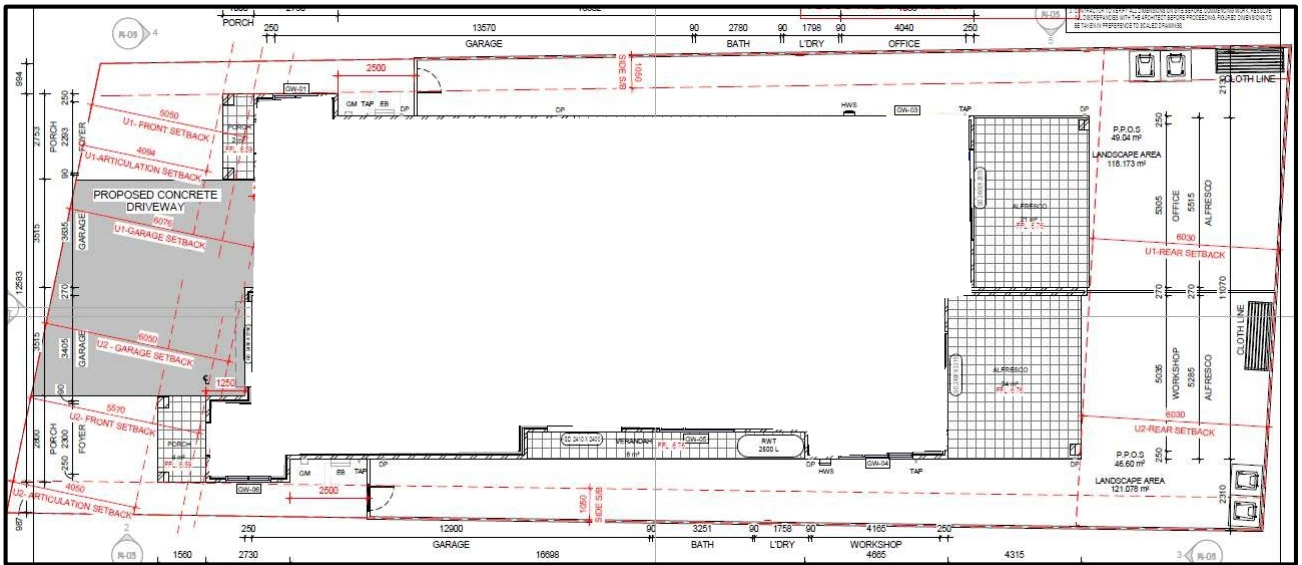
Ground Floor Plan (Room layouts with dimensions)
